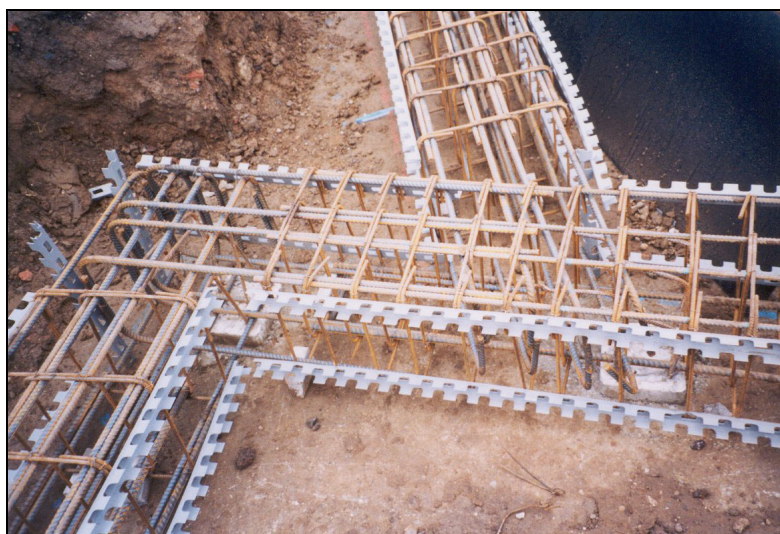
In-situ ground beam over two piles showing cover strips and reinforcement over a blinding layer
